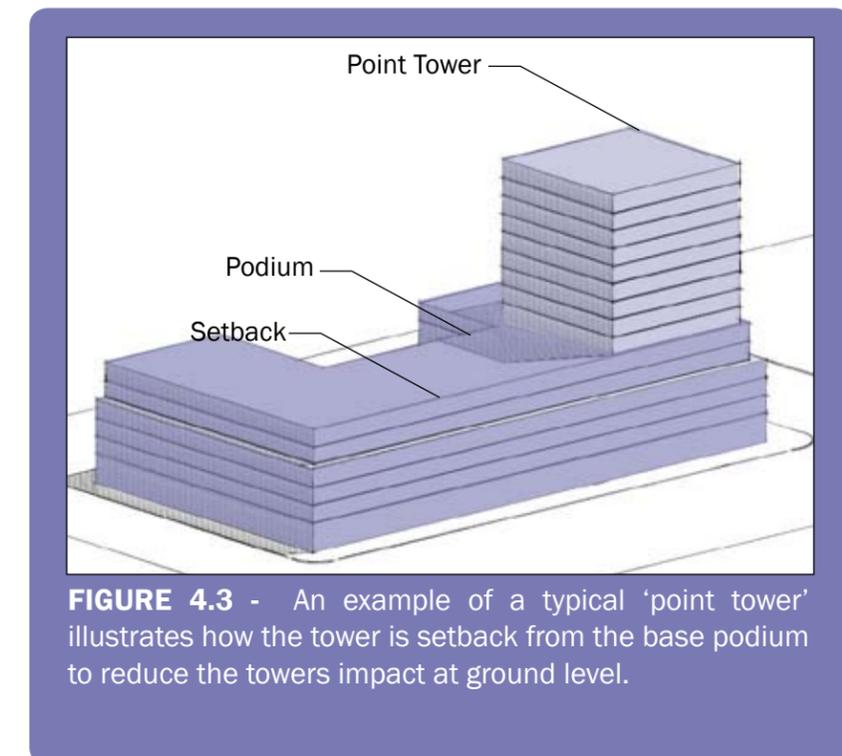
An example of a typical ‘point tower’ illustrates how the tower is setback from the base podium to reduce the towers impact at ground level.
